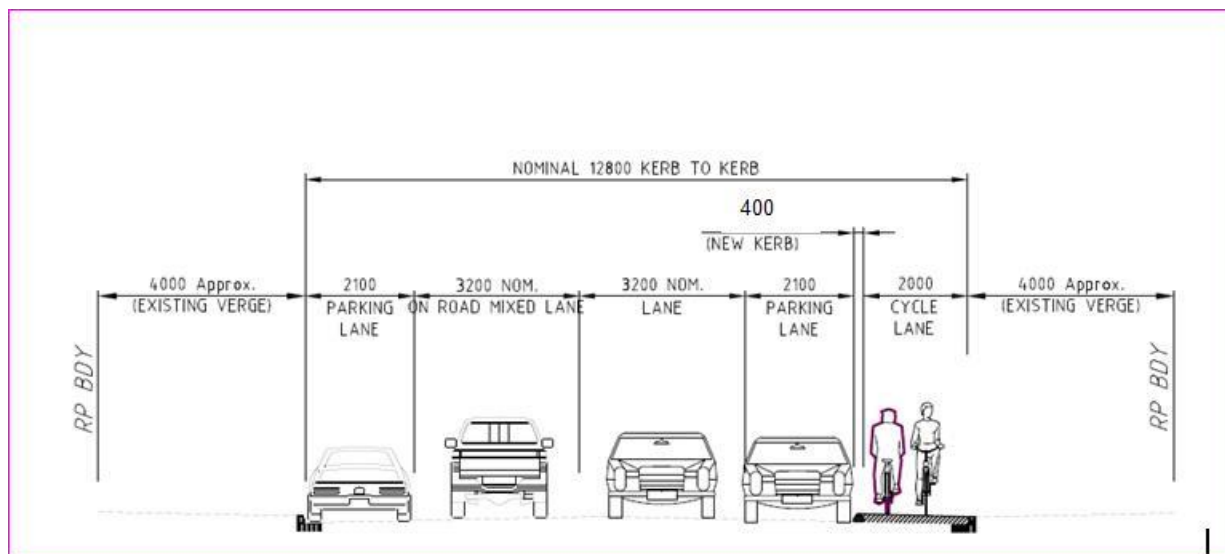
Typical cross-section on Livingstone Road (LR3) with 2.0m bike path and 2.1m parking lanes.
